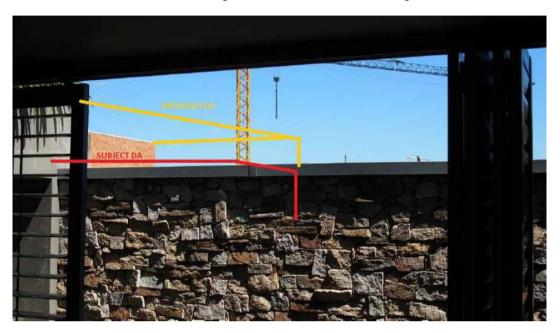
View from ground level within 95 Union Street, McMahons Point (Living Room)
